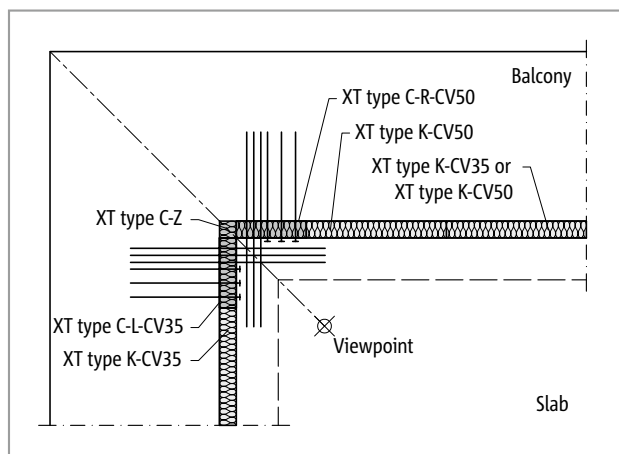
Schöck Isokorb® XT type C: Balcony with outer corner freely cantilevered (application XT type C-L-CV35, XT type C-R-CV50)
